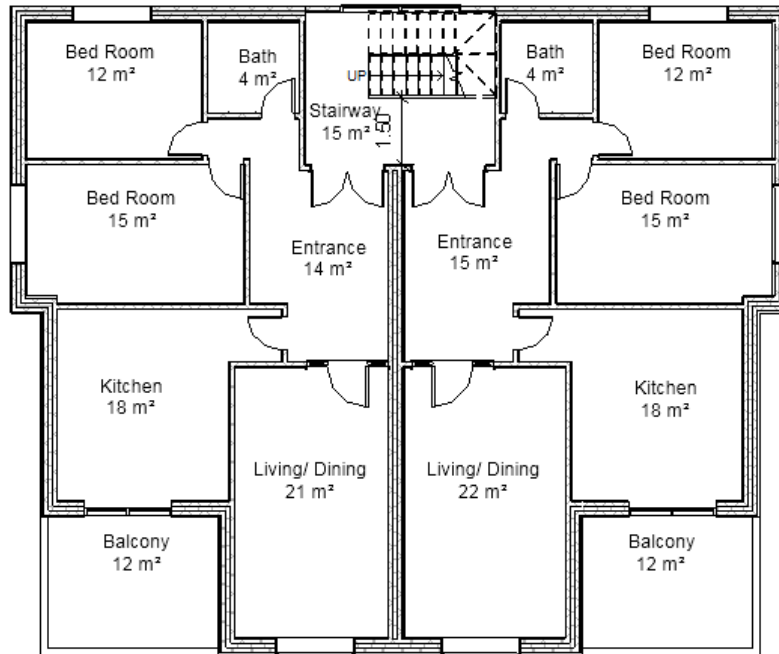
Typical plan to be used for simulations for balcony structure surrounded by 2 walls overlooking the west orientation, Source: Author
